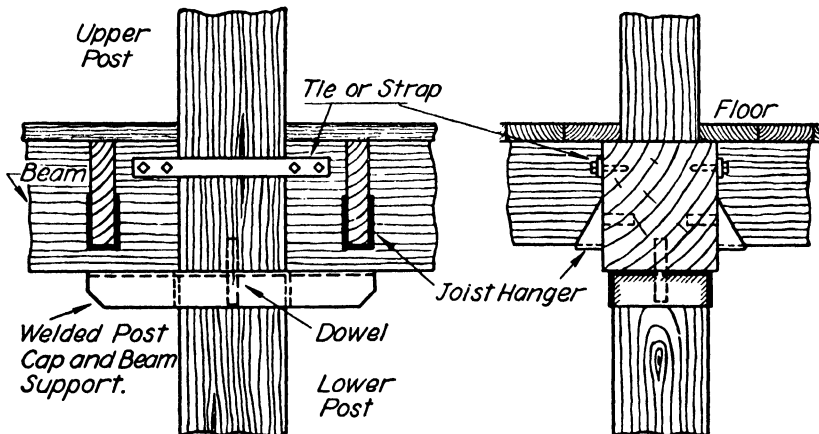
USE OF WELDED STEEL COLUMN CAP AND JOIST HANGERS TO SAVE HEADROOM.
